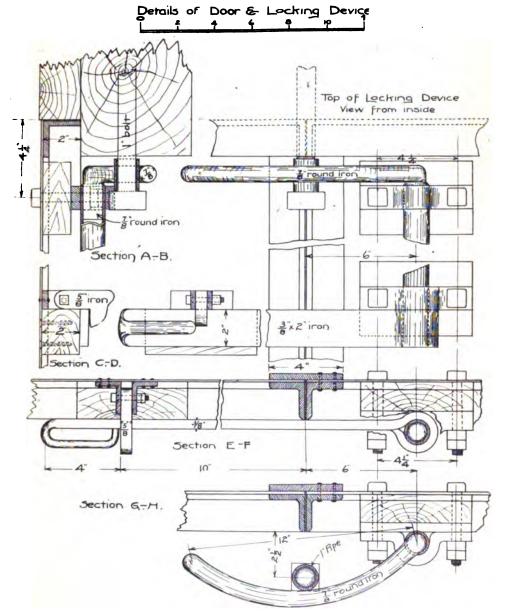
Details of Locking Arrangements for Engine House Doors, B. & O. R. R. 16
